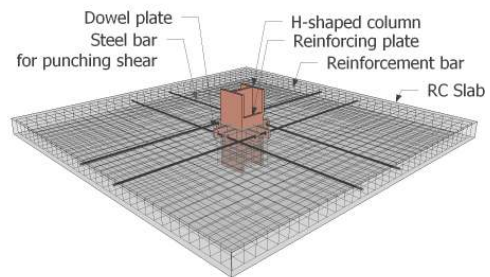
H-Steel Column + Flat Plate Slab Connection System
